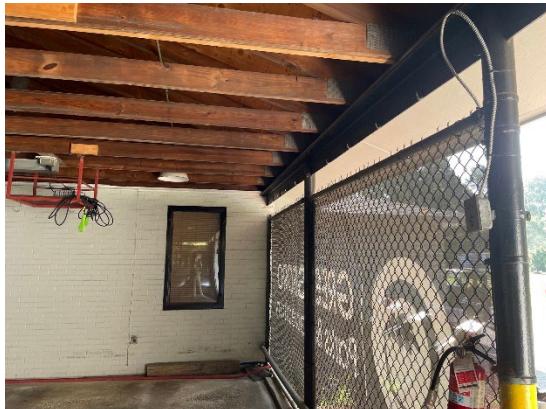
Wood Roof Trusses & Perimeter Steel Beams
